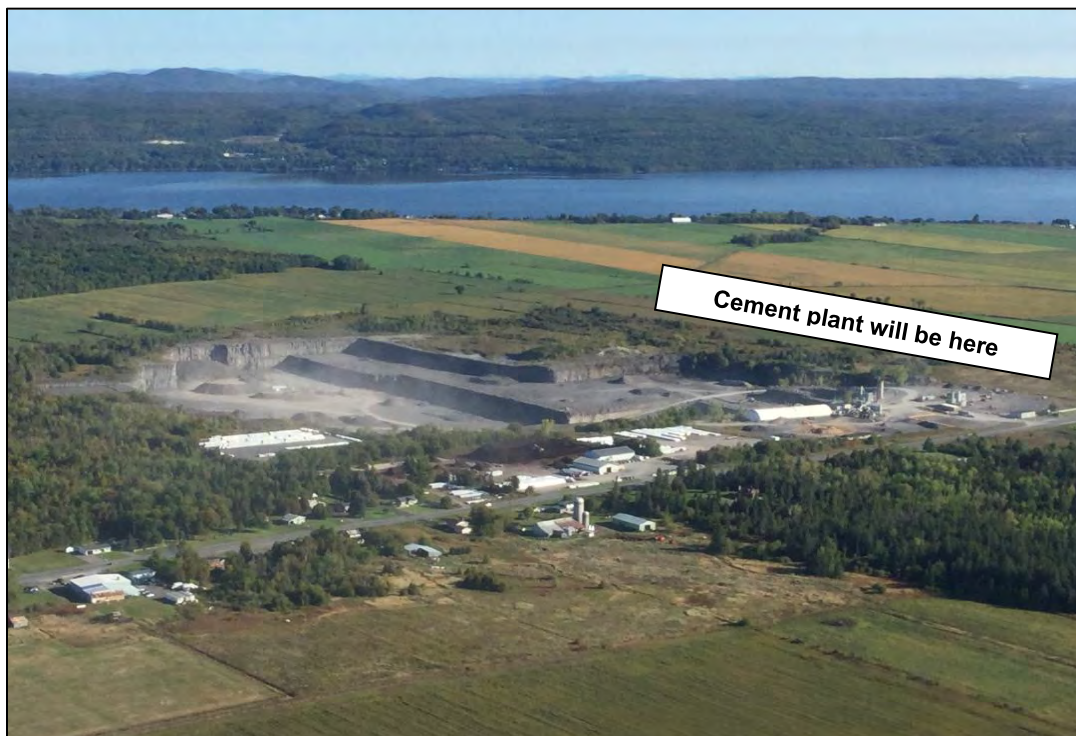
Aerial view looking north towards the Ottawa River with the Colacem quarry in the foreground. The proposed cement plant site location has been indicated by a text box.
